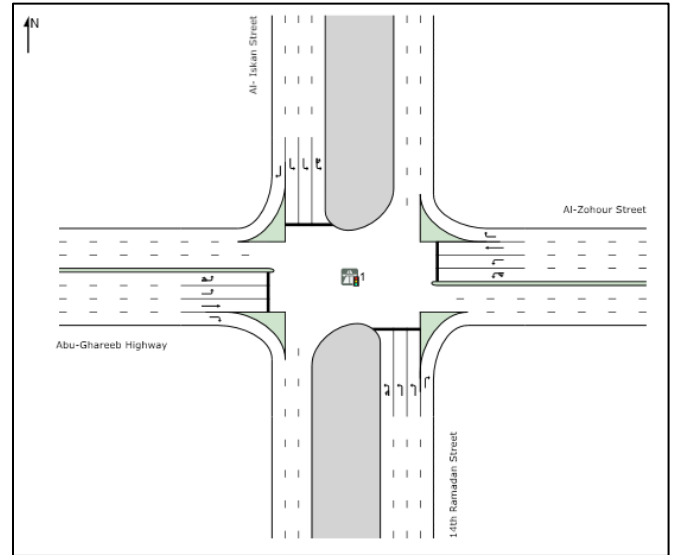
Geometric layout of the intersection via SIDRA INTERSECTION
